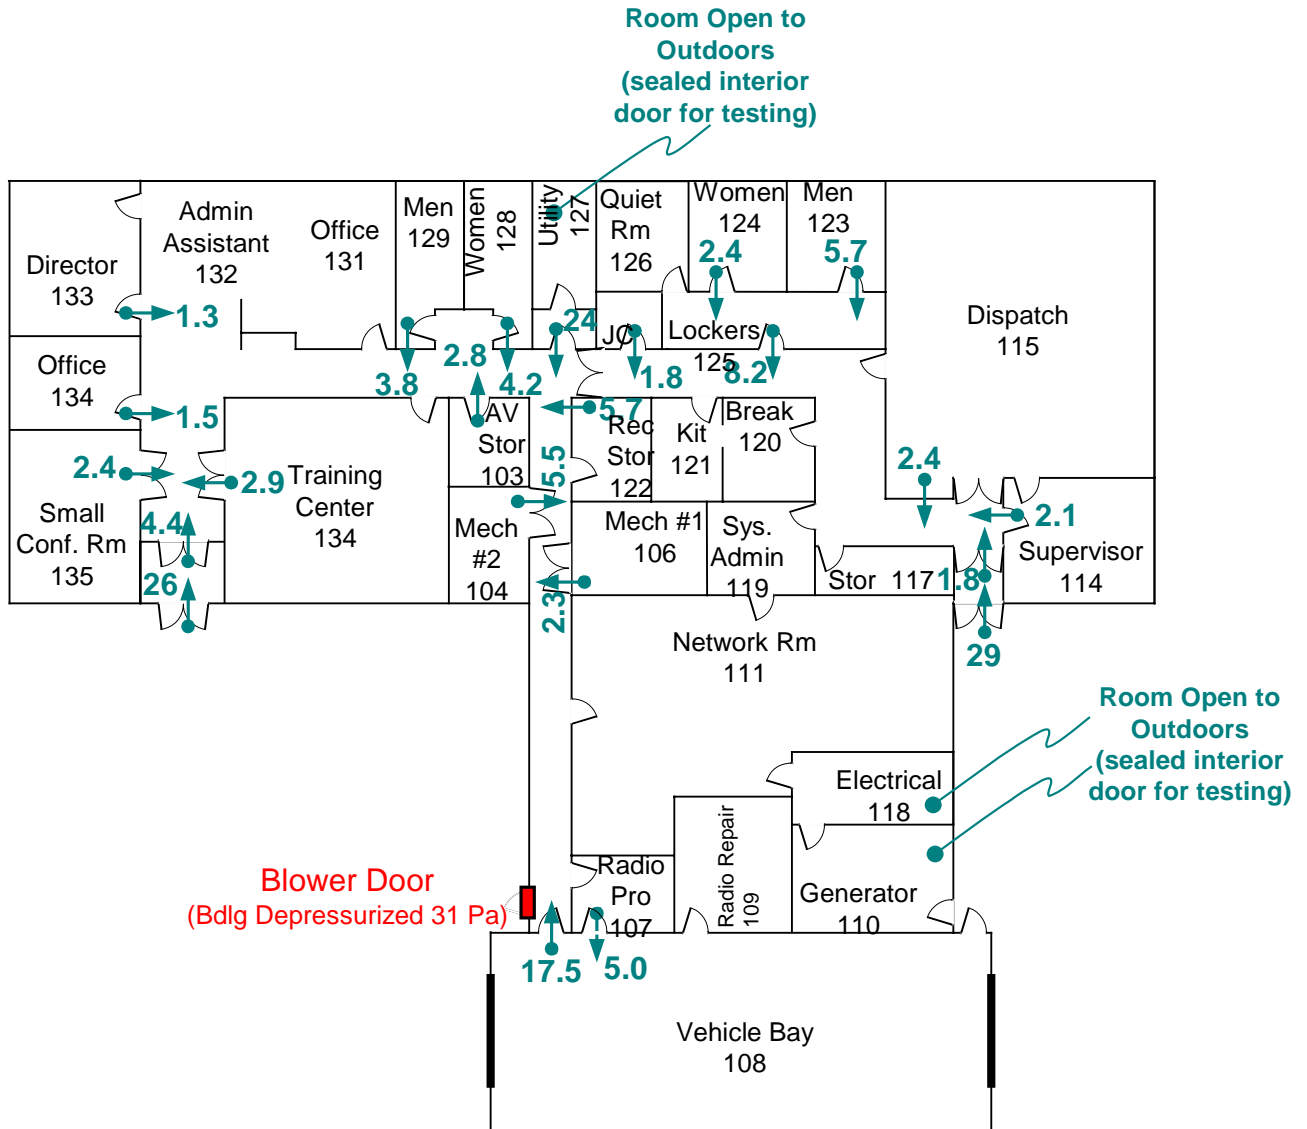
First Floor Room-to-Corridor Pressures with Building Depressurized
